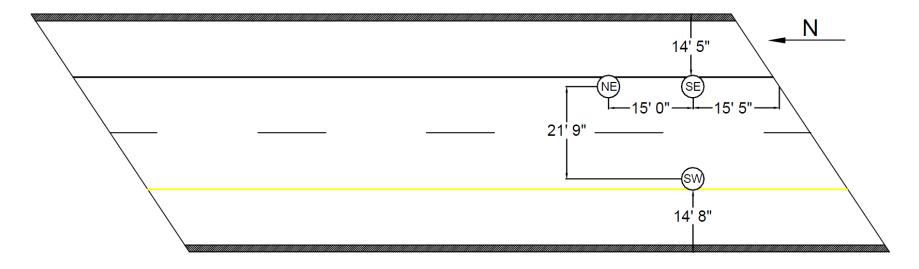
Sensor locations on Dannon Way northbound internally cured concrete deck.
